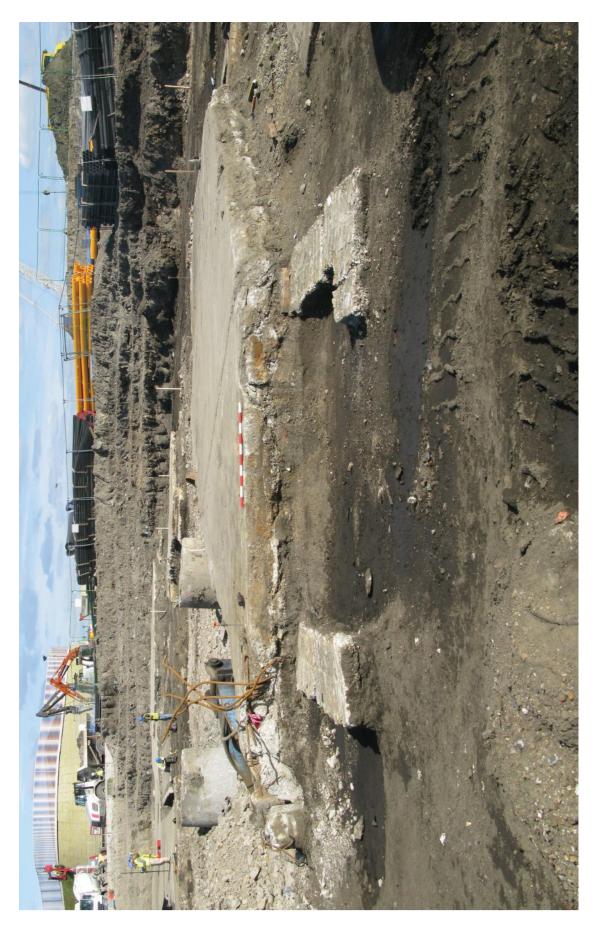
Detail of in-situ holdfast, Building 14, looking south
